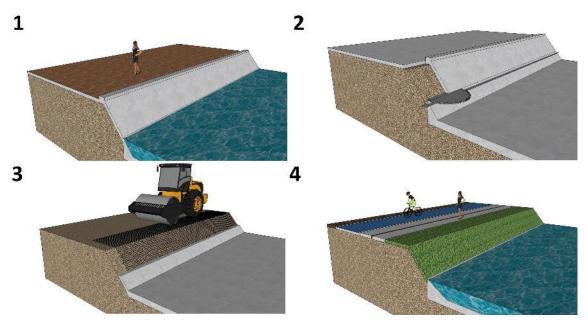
Schematic view of culvert works in Peynircioğlu Stream
